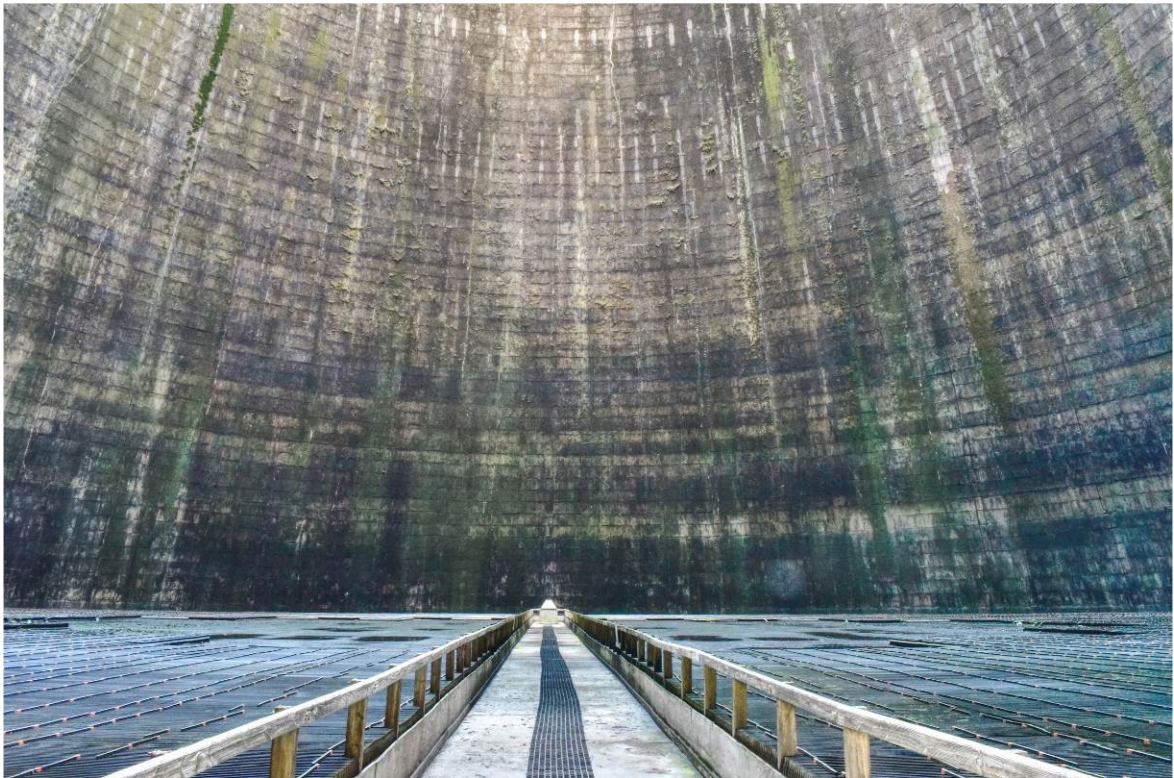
Cooling tower 2a interior at eliminator level, looking south-west along head of main distributor culvert.
